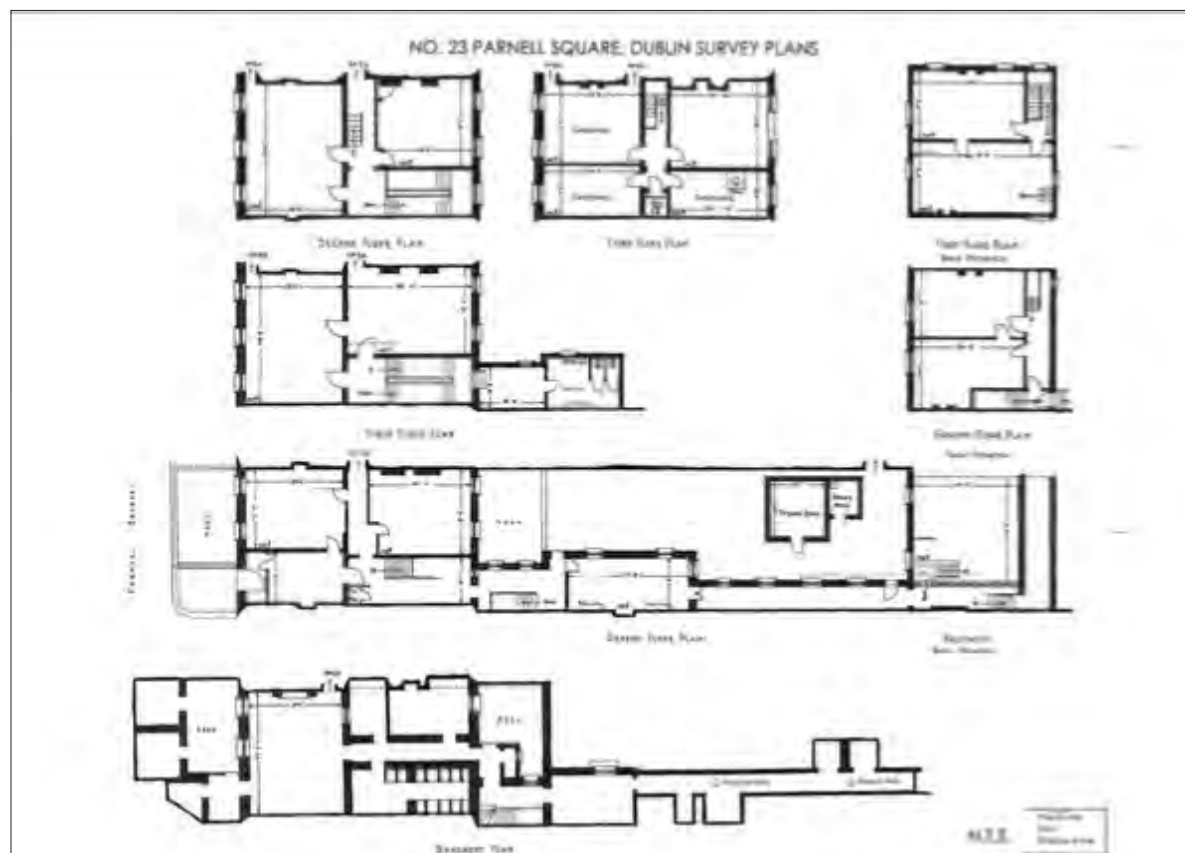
No 43: Plan form substantially intact. Front entrance doors and steps remain, with inner porch. Connection formed in party wall to No 24 with corridor formed in rear ground floor room. Extensive return structure to the rear - 2 storeys over basement with open basement area to rear.
